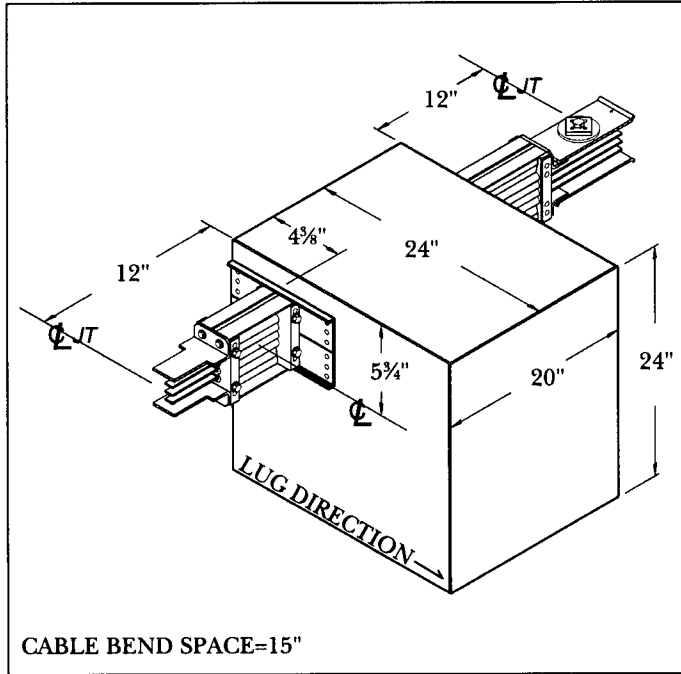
Center Tap Box: Feeder or Plug-in
